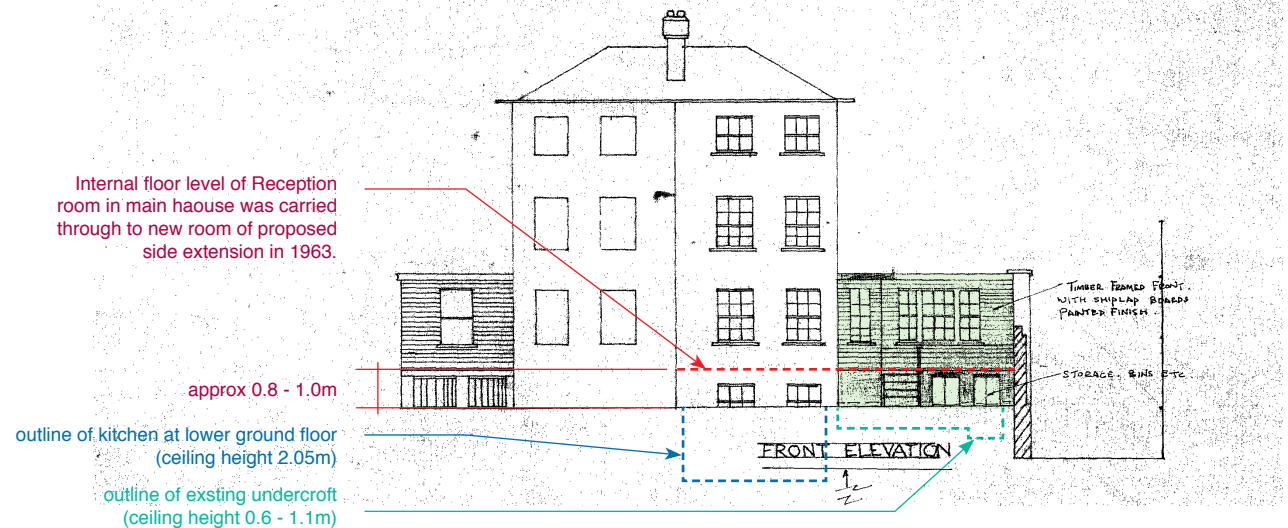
Drawing from 1963 application 24895 (See also Appendix III). Proposed extension shaded in green.
